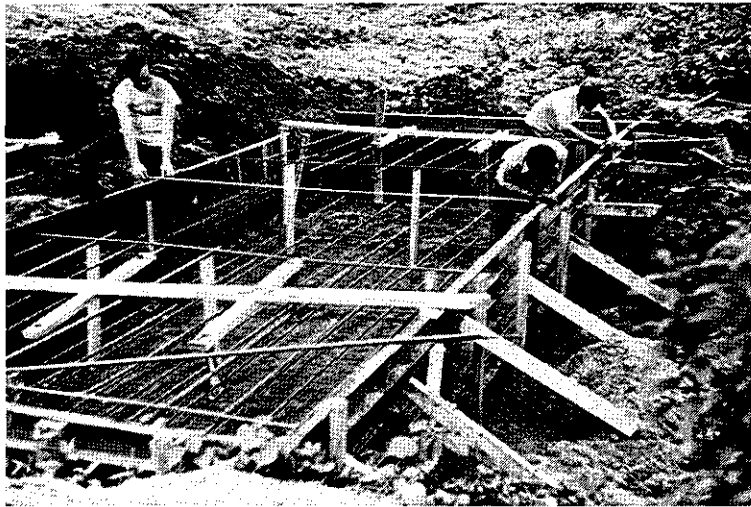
Photograph of formwork for concrete mat showing formwork, concrete inserts, and reinforcing steel.
